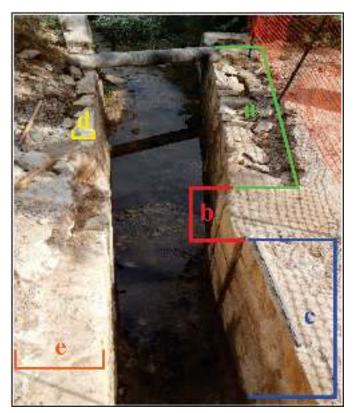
a) Upper Acequia walls, b) headgate, c) lower walls, and d, e) wall width.
